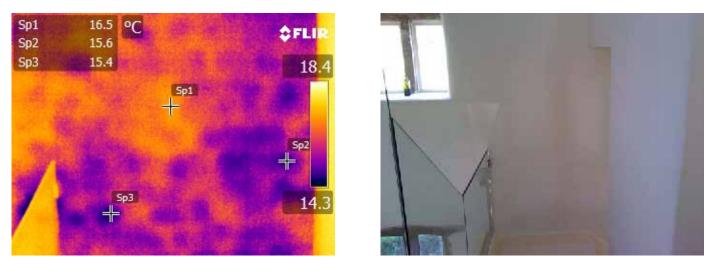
White House Farm, Stirton, Skipton – North exterior wall on staircase.
